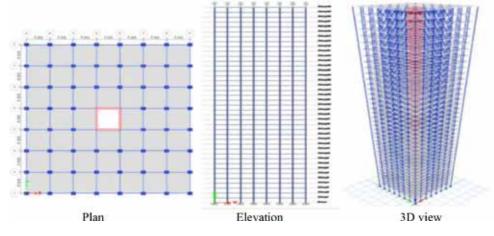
Typical floor plan, elevation & 3D view of Conventional Outrigger
